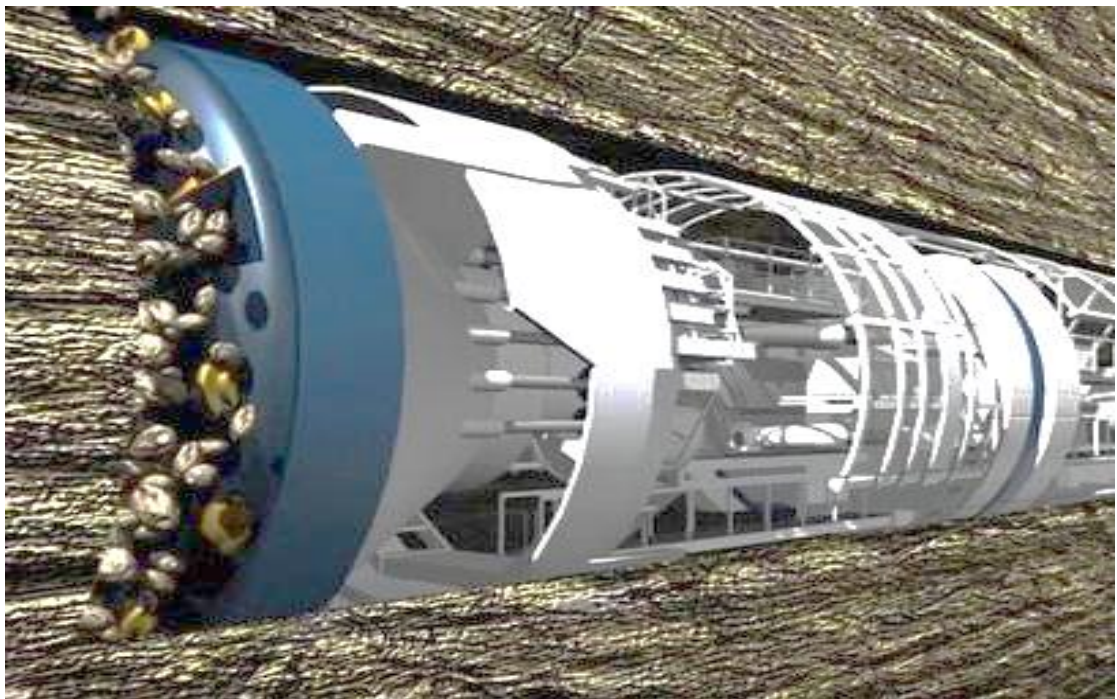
Interfacial soil adhesion during tunnelling (openPR.com, 2019).
